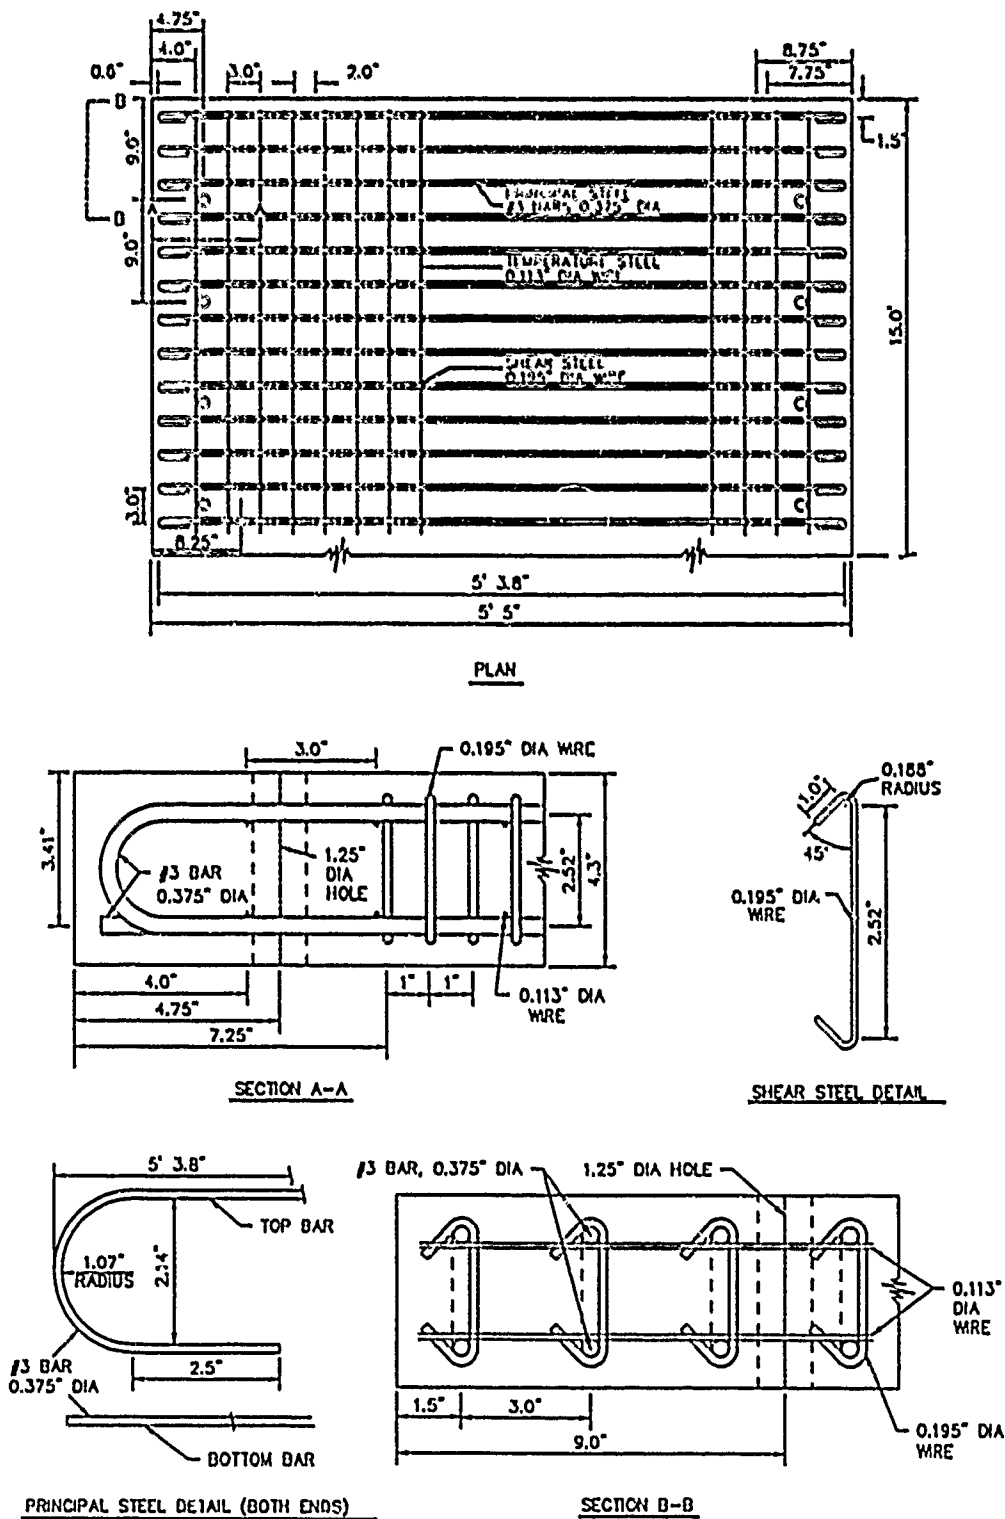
Reinforcing steel layout for test slab with L/t of 10.
